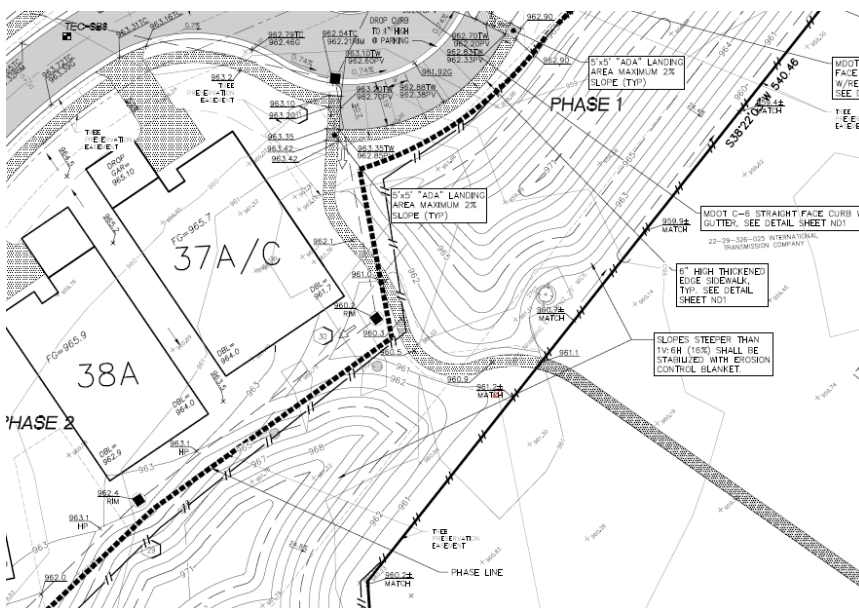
Phase 2 Final Site Plan, 2/3/2021
